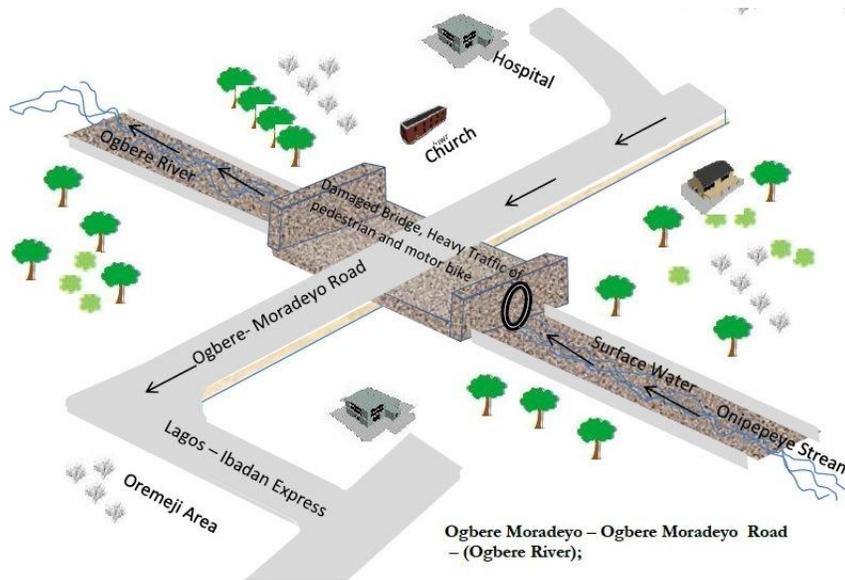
Schematic diagram of Ogbere Moradeyo – Ogbere Moradeyo Road – (Ogbere River)
